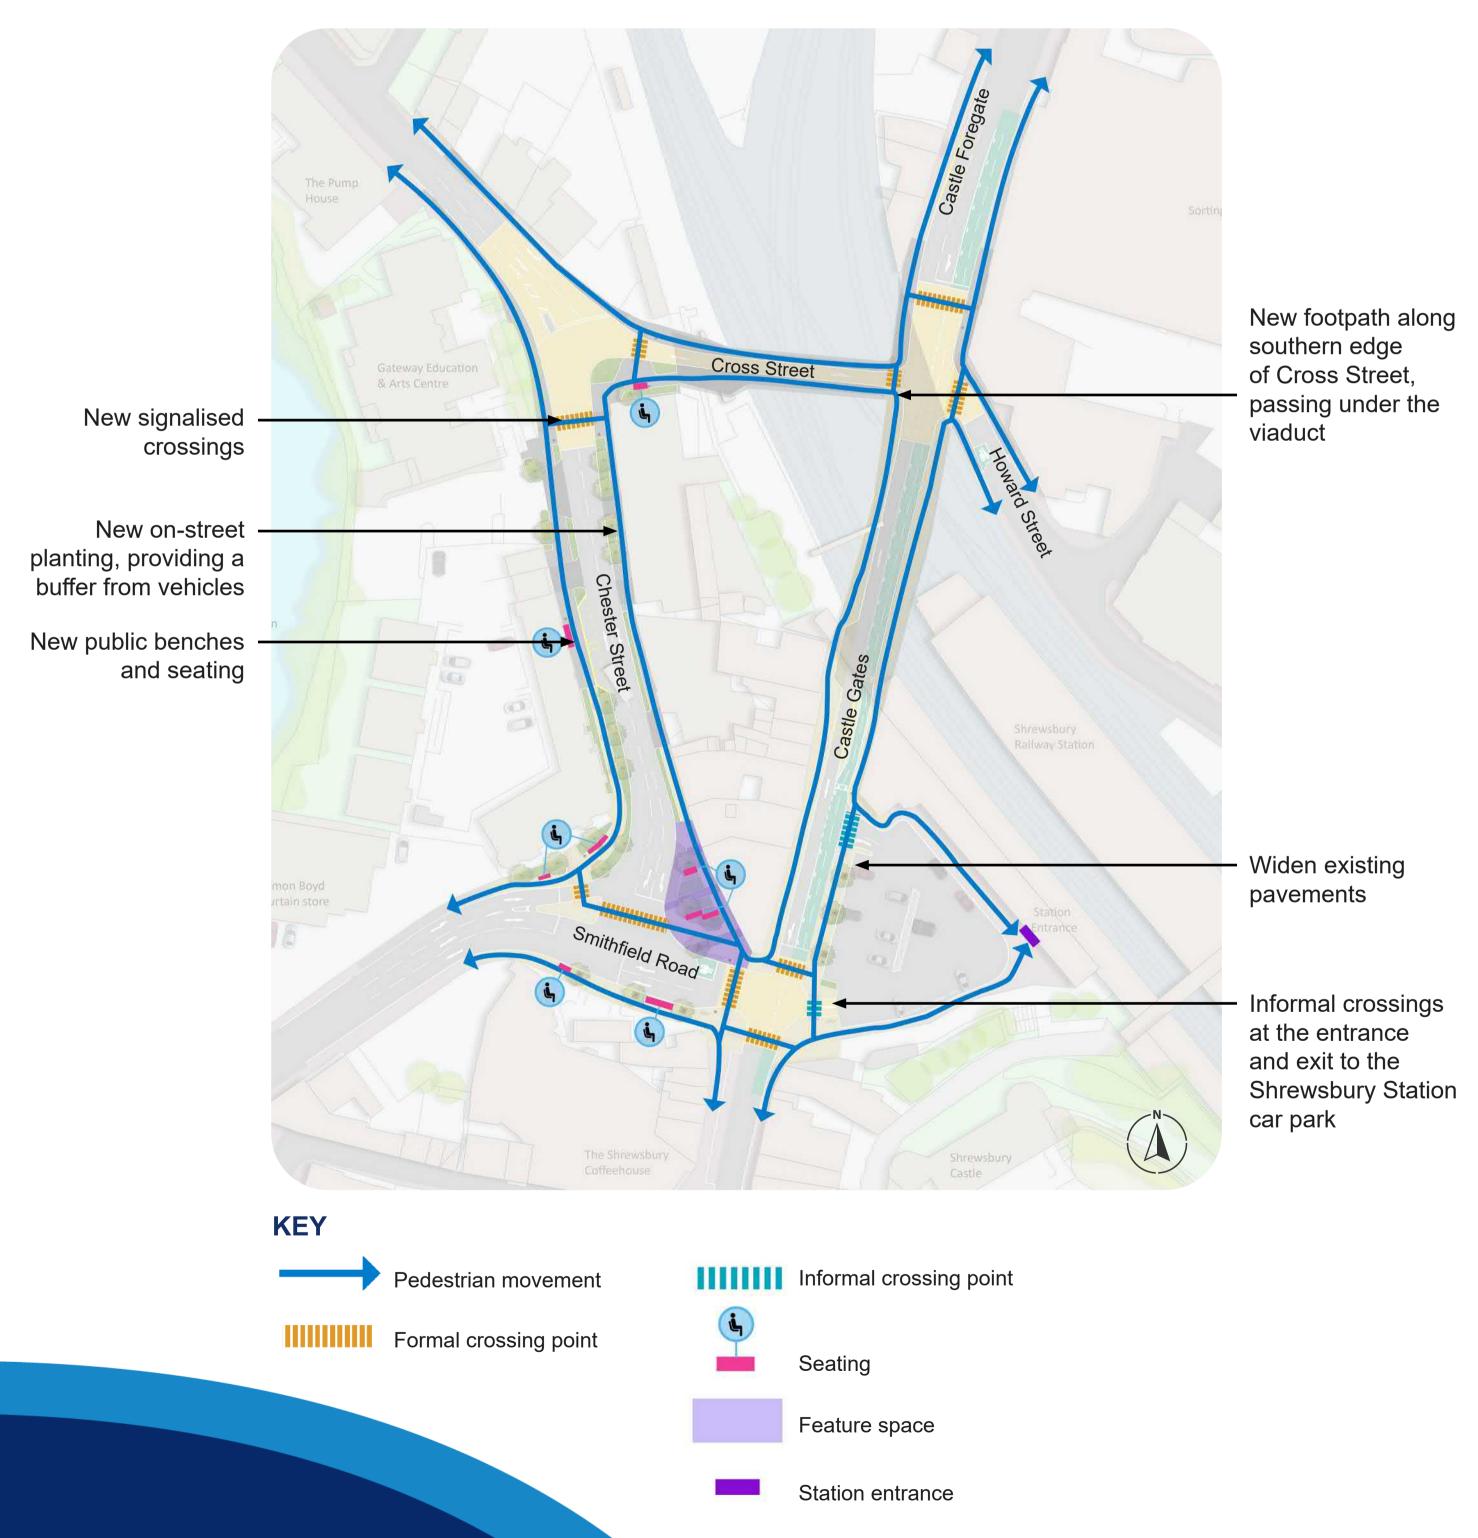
DETAILED PLAN OF PROPOSED IMPROVEMENTS
